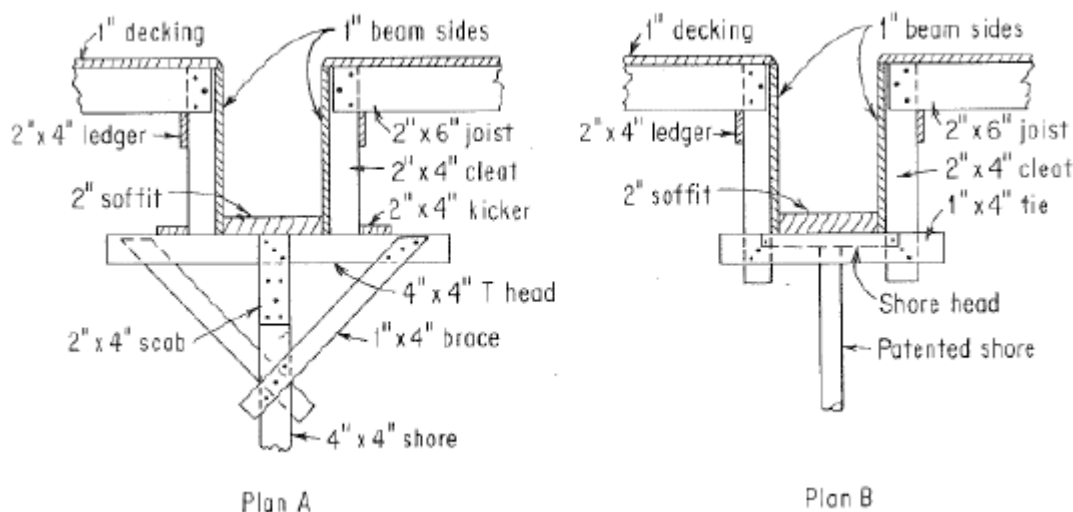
Formwork in Concrete Encased I-beam
